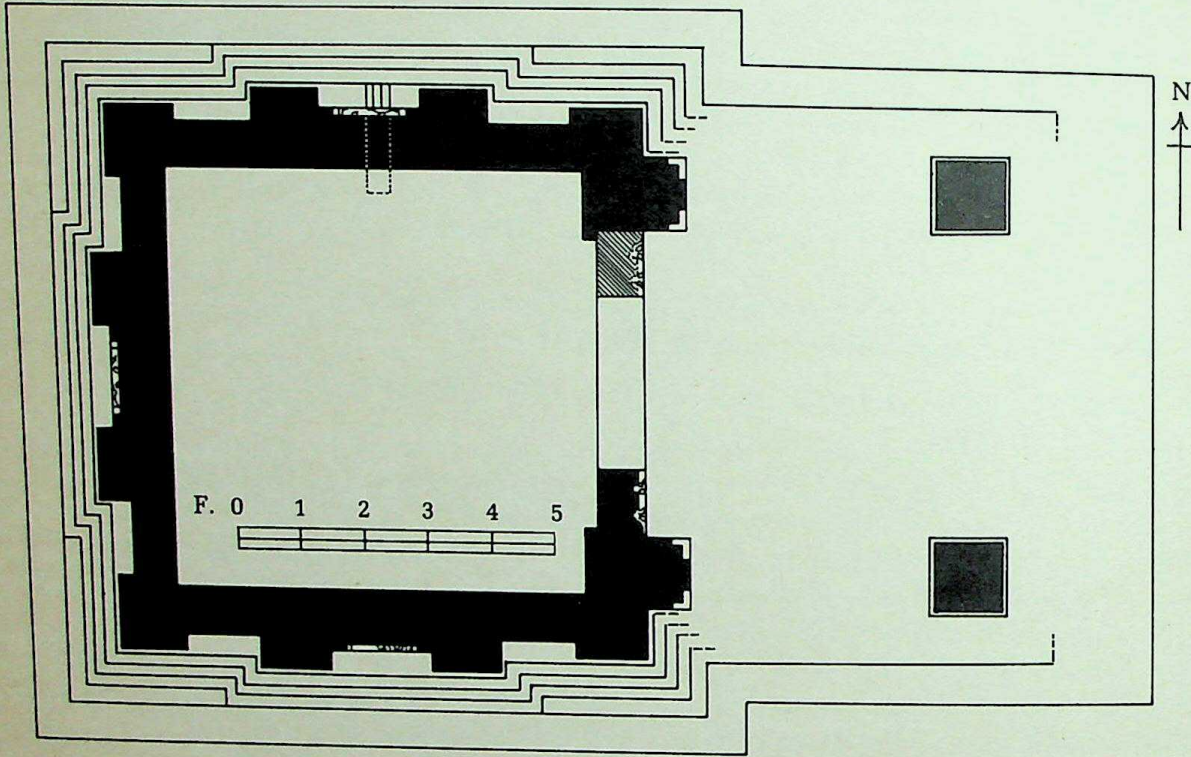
Mahuā. Śiva temple no. 1, plan.
